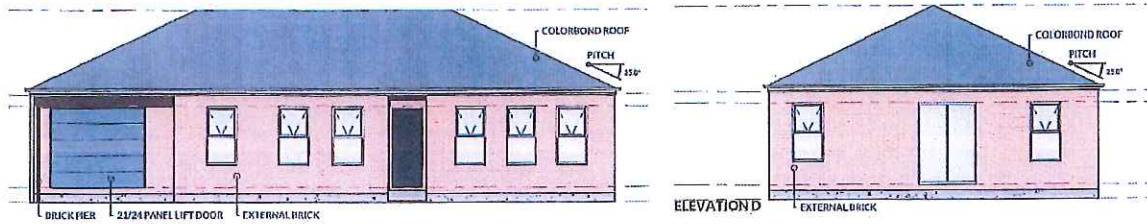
Proposed elevations facing King Street (LHS) and Main Road (RHS), as per application.
